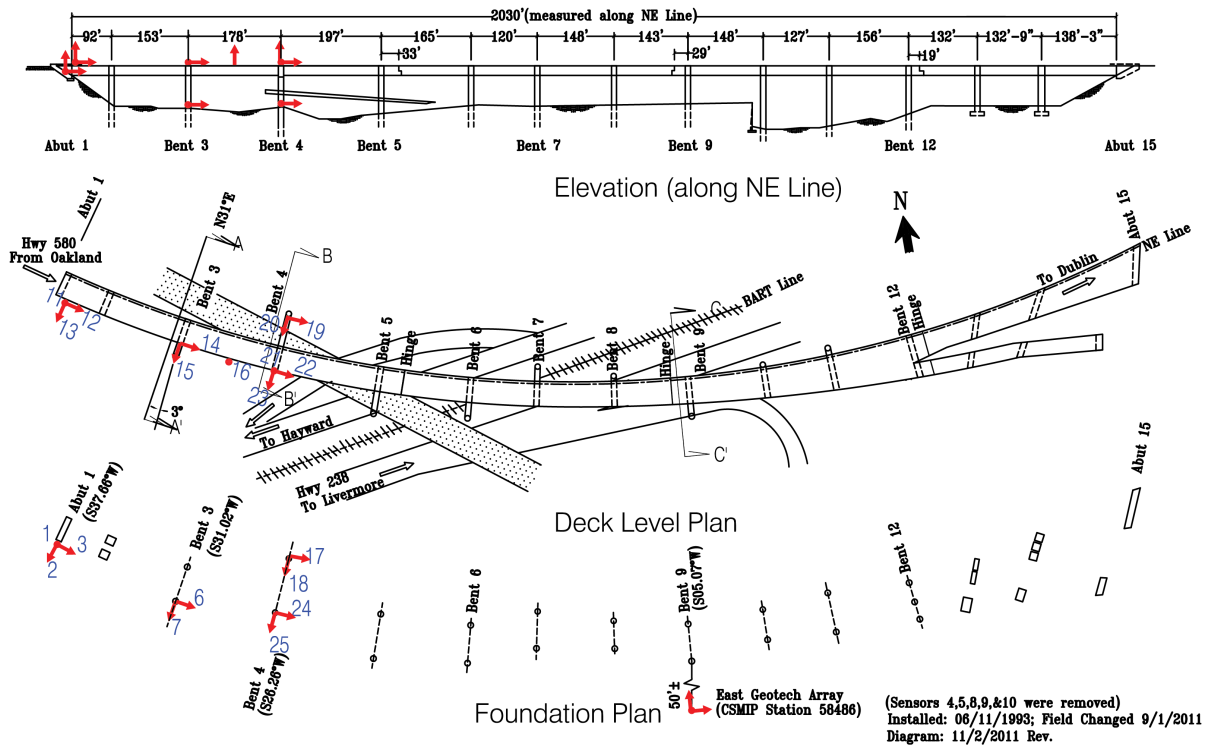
Hayward Bridge plan sketch with section views of column bents and in-span hinges.
